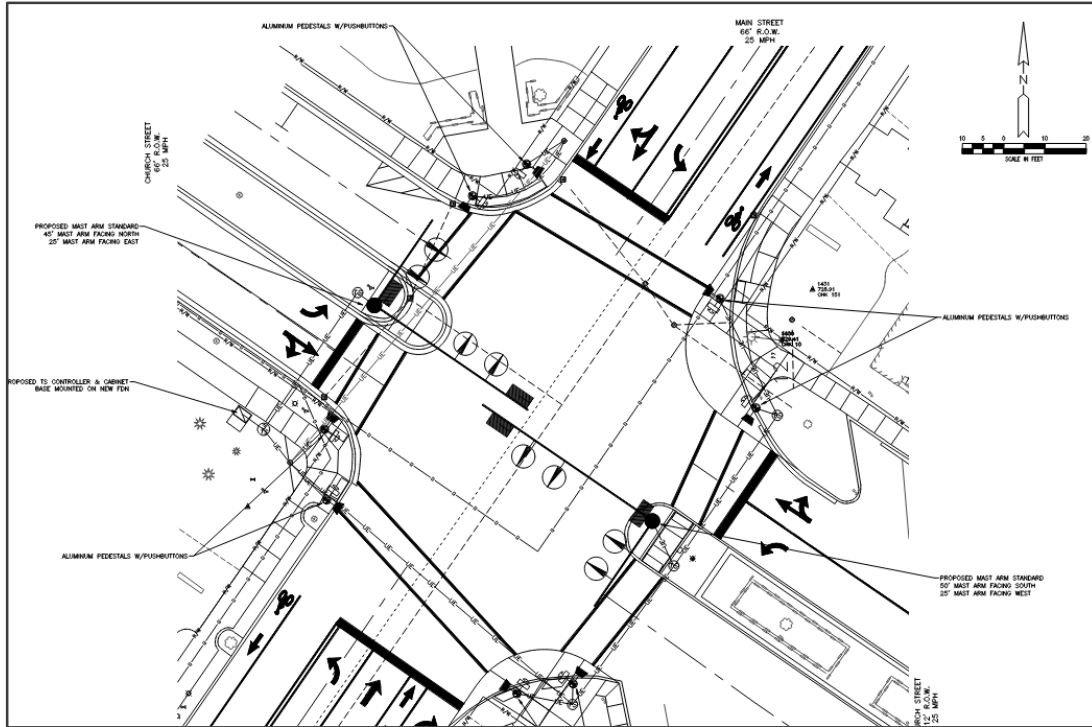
Section of a site plan drawing titled “Traffic Signal Construction Plan,” dated December 28, 2023, and prepared by Wade Trim for the “2024 Infrastructure Improvement Program” project.
